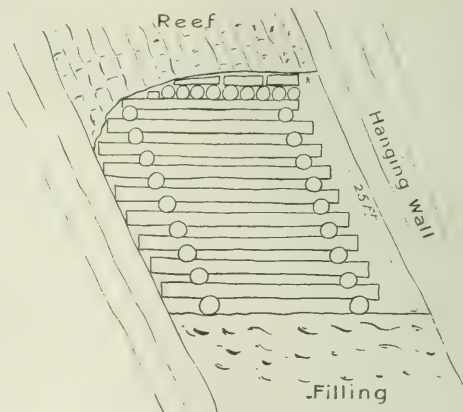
TIMBER PACK, LEAVING ROOM TO PASS ON HANGING-WALL SIDE.
